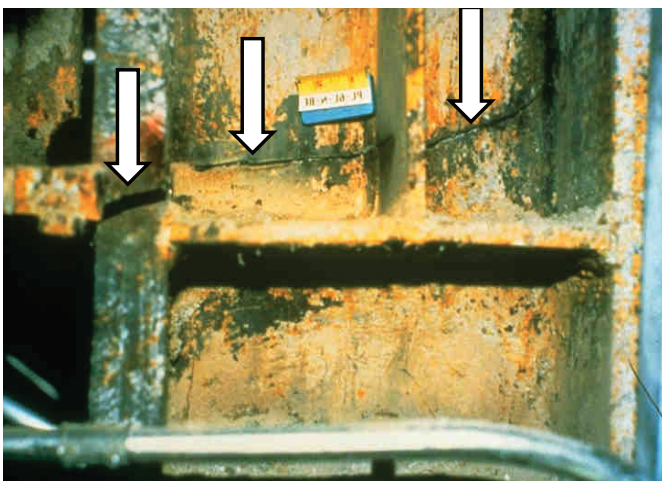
Fracture extending through column flange and web. (Photo by Dave Norris)
